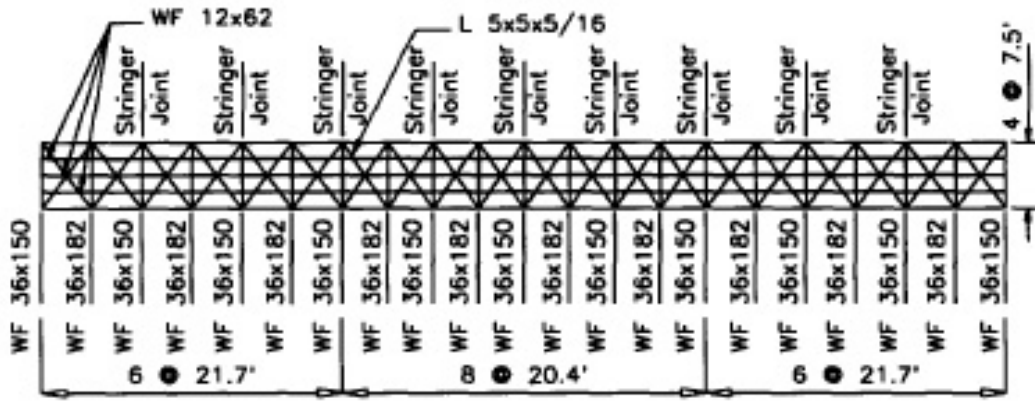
Transverse bracing profile for the three-span bridge tested by Idriss et al. (1995)
